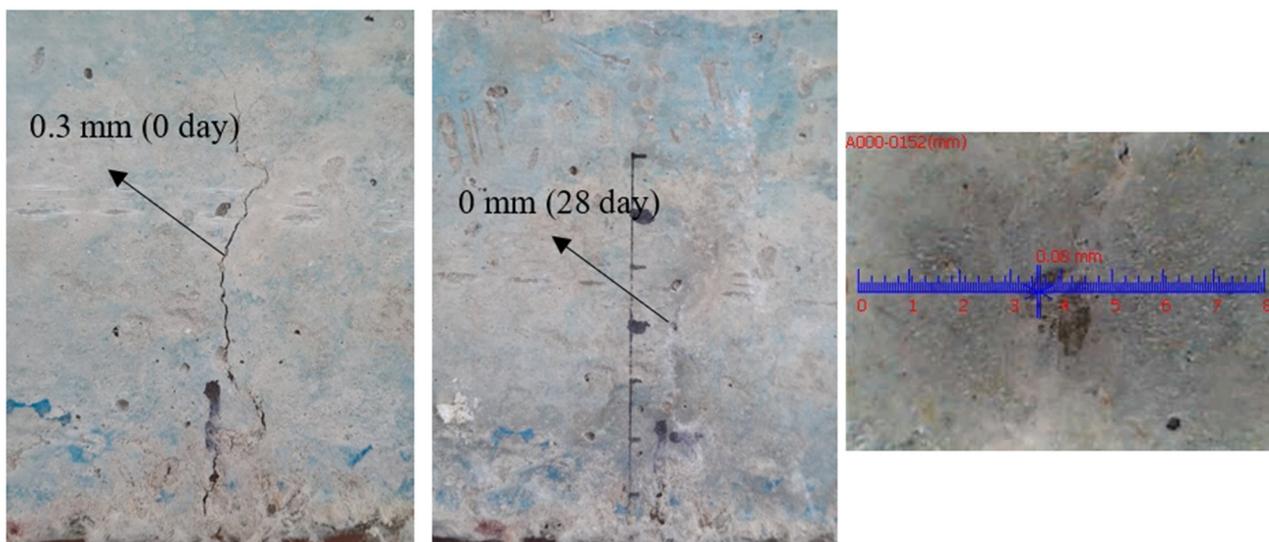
Crack width healed in Beam “TCHS-2” using the silica gel plus crack-healing solution.
